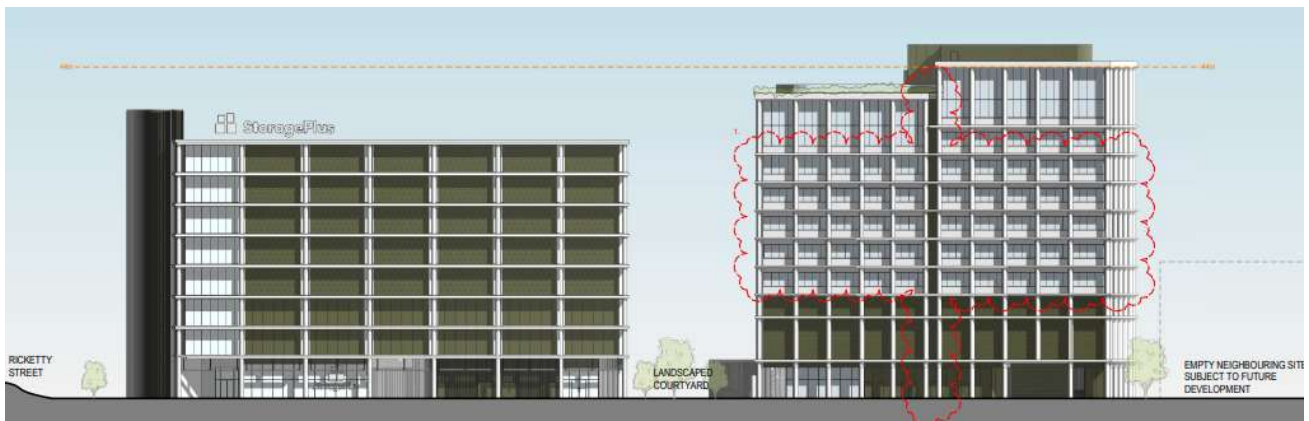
Eastern elevation (from Venice Street) [supplied by applicant]
